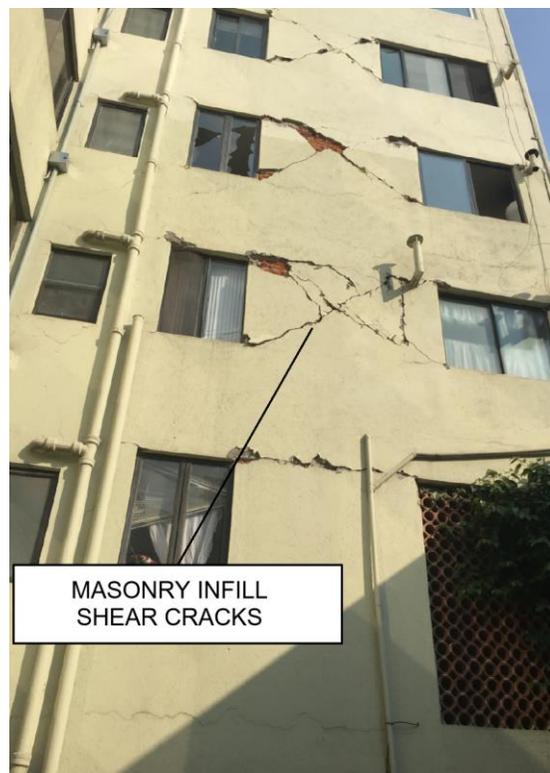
Masonry Infill Exterior Wall Damage (Line 3)
